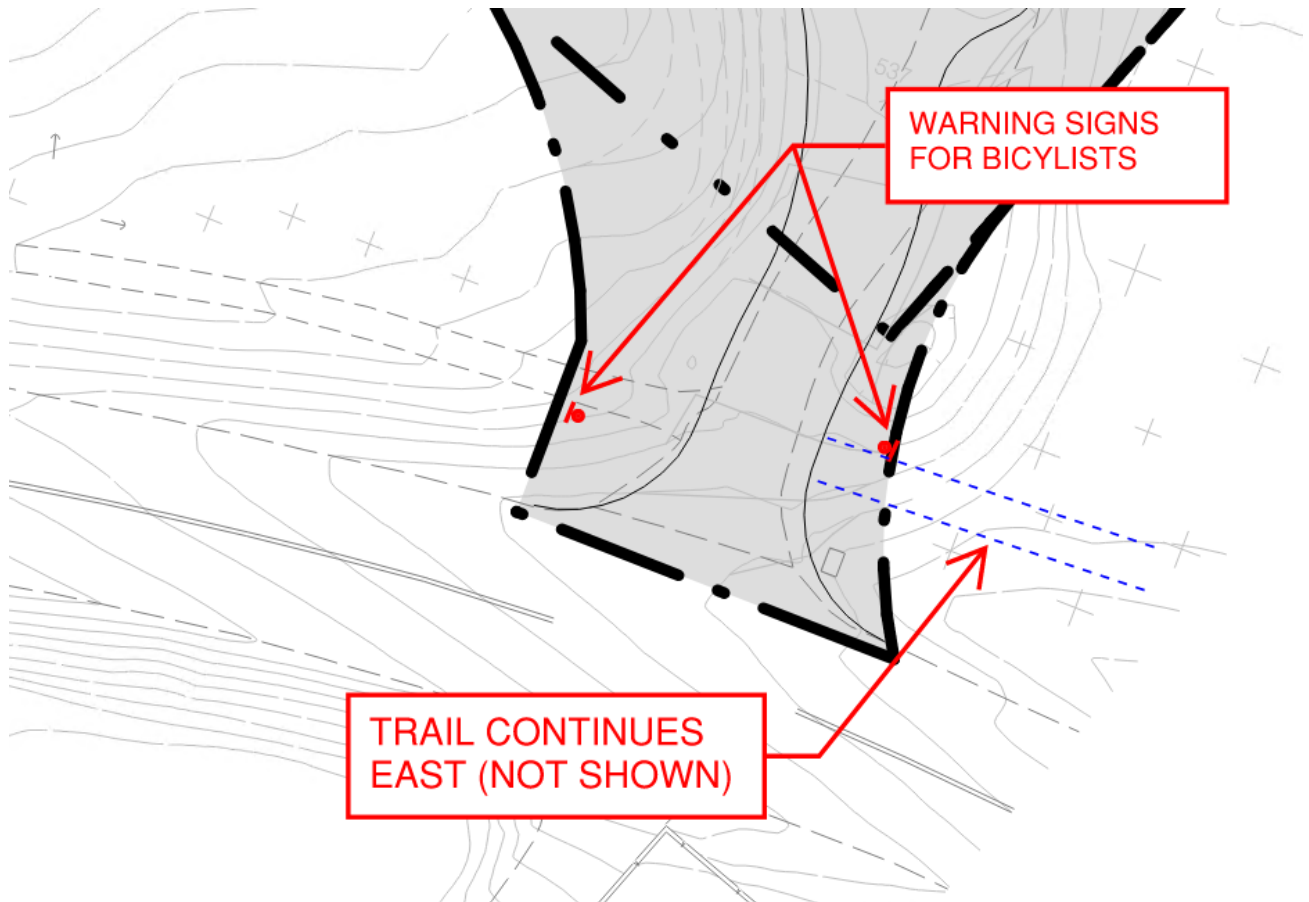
Recommended Warning Sign and Potential Stop Sign and Stop Bar
